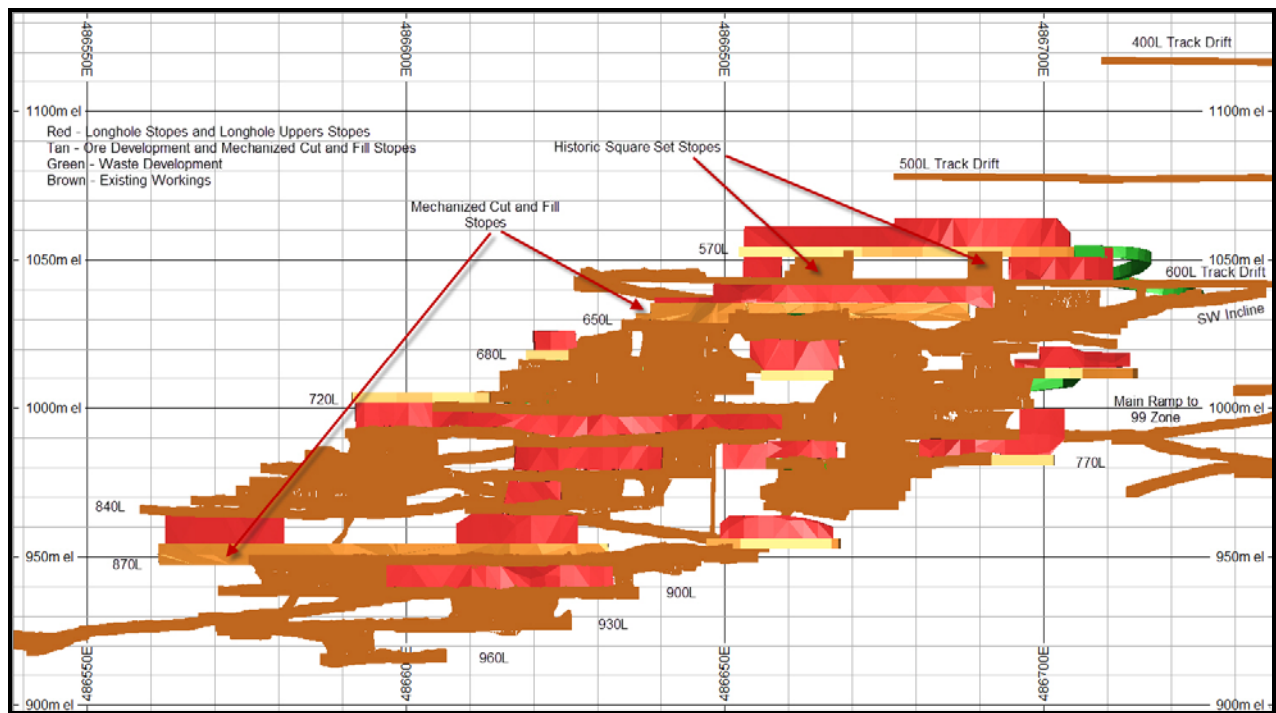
Longsection Looking Northwest - Bellekeno Southwest Zone Mining Shapes (SRK, 2013)
